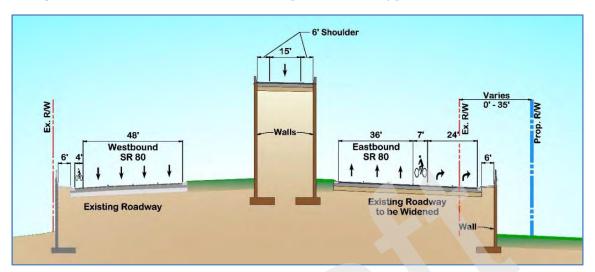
Build Alternative 3 - Proposed SR 80 Typical Section West of I-95
